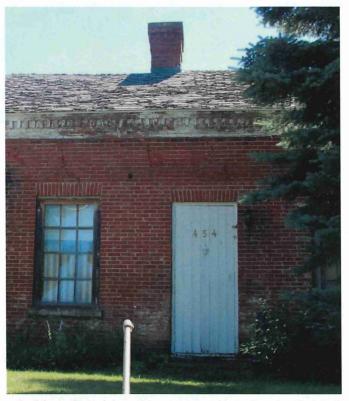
Detail of front (west) facade entrance. Note the dentil detail on the cornice.
